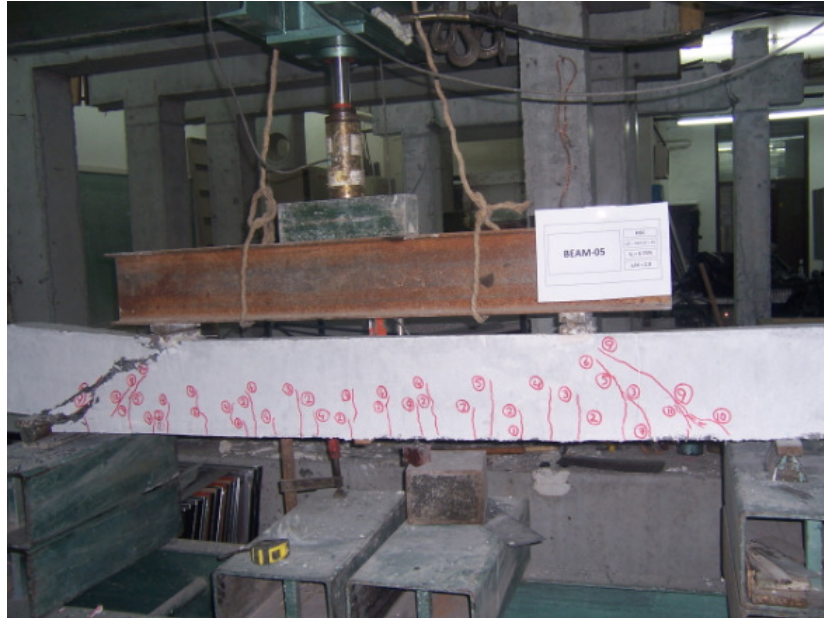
Crack propagation and damaged shape of the specimen BEAM-05
